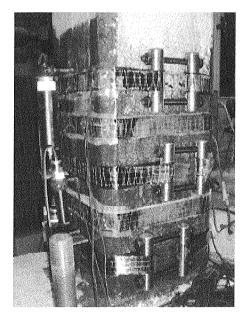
Arrangement of longitudinal/transverse steel bars in test columns
